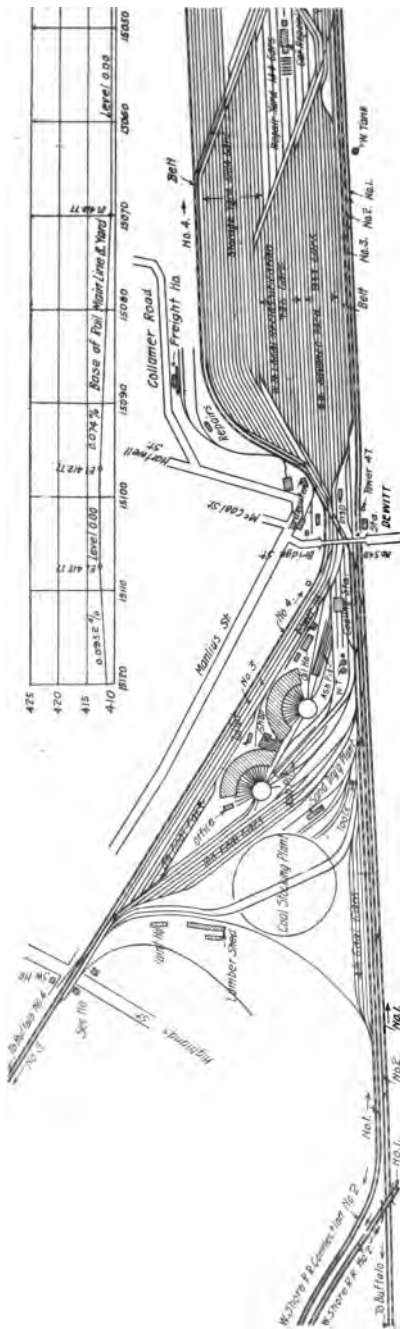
Plan of West Half of DeWitt, N. Y., Yards, New York Central & Hudson River.
